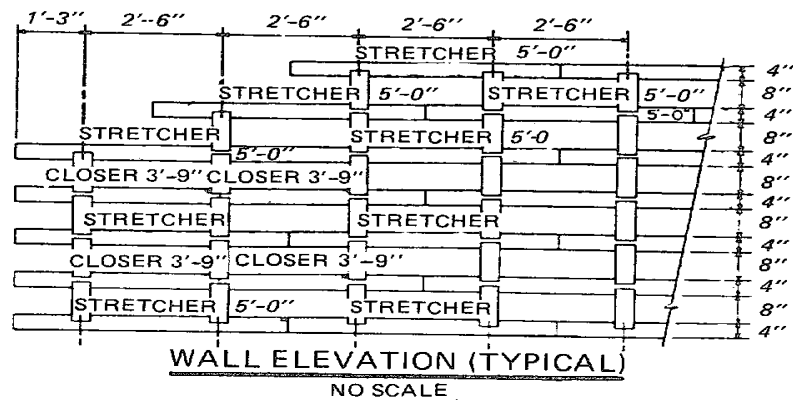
Materials used to construct Doubleweal retaining wall
